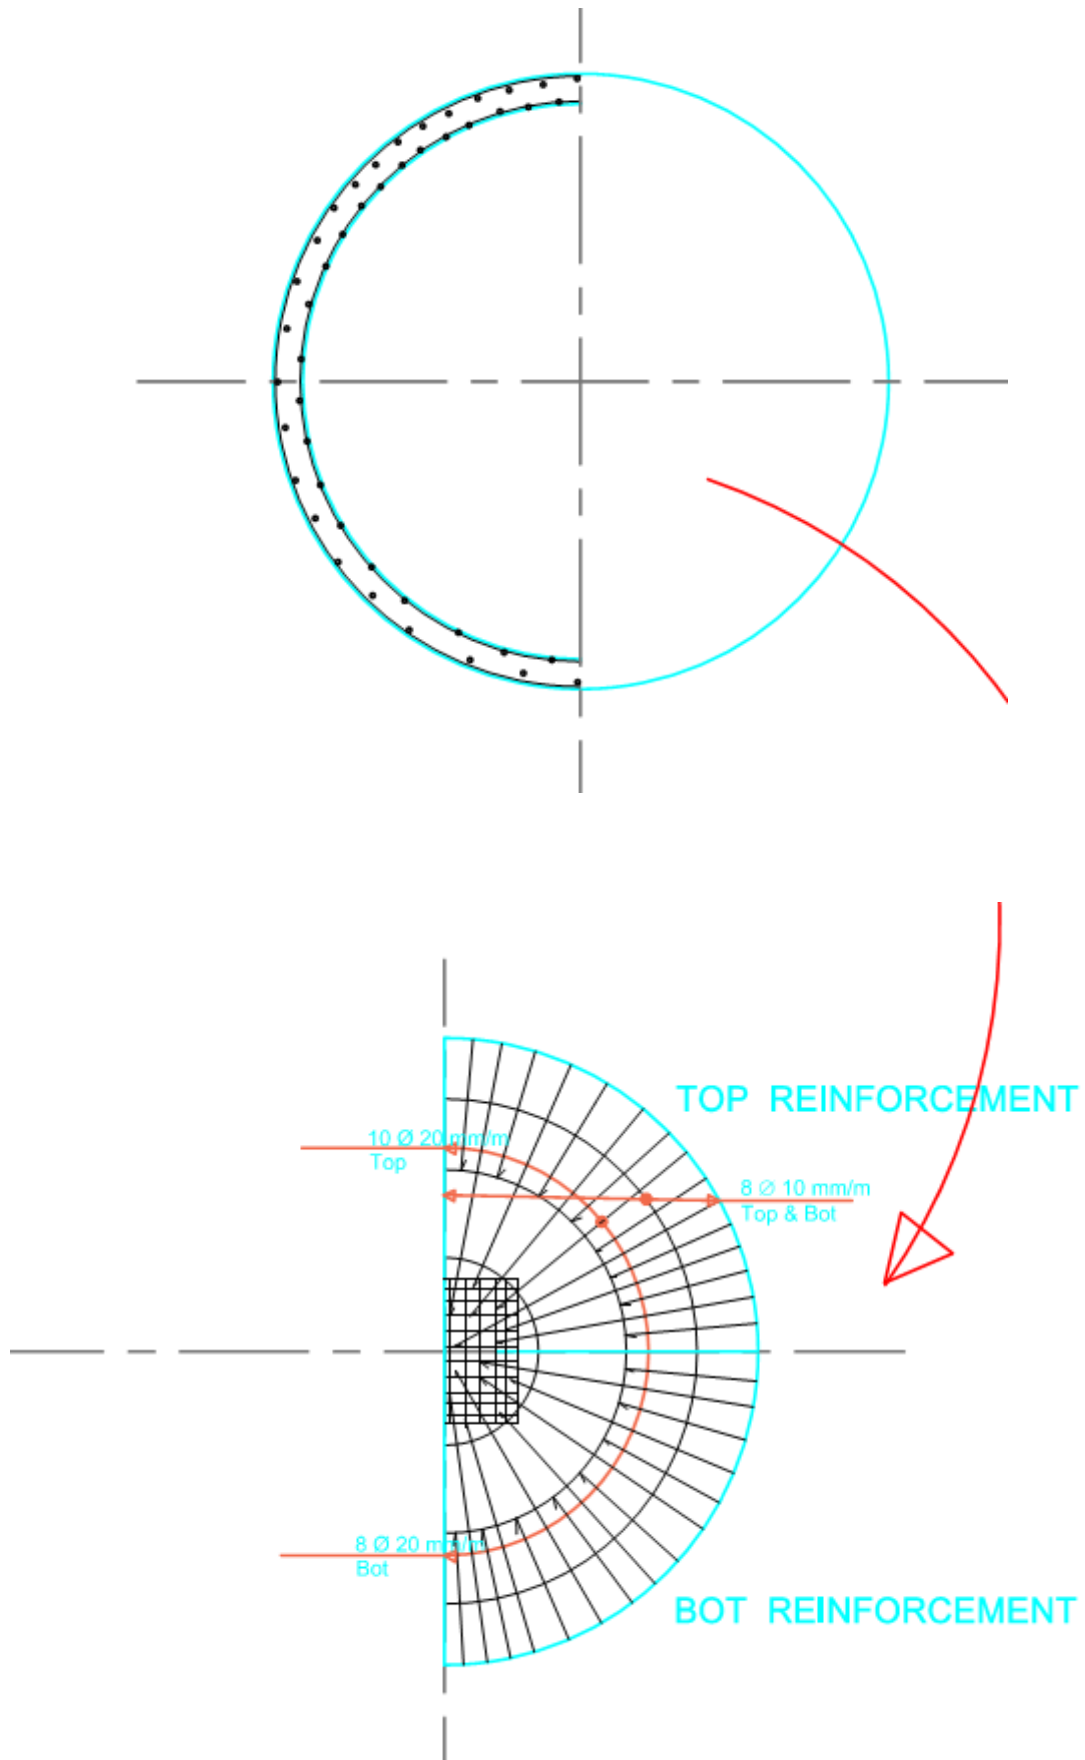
Circular water tank-Top& bottom slab reinforcement
